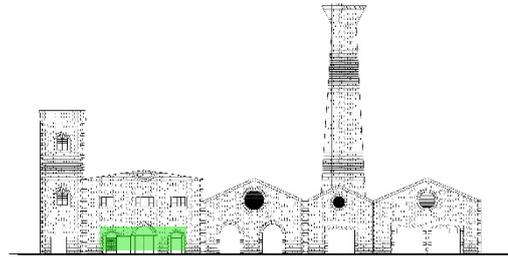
Encroachment - South-east Facade, Barrack A, 15 to 17A, East Wharf, KPT, Karachi.
